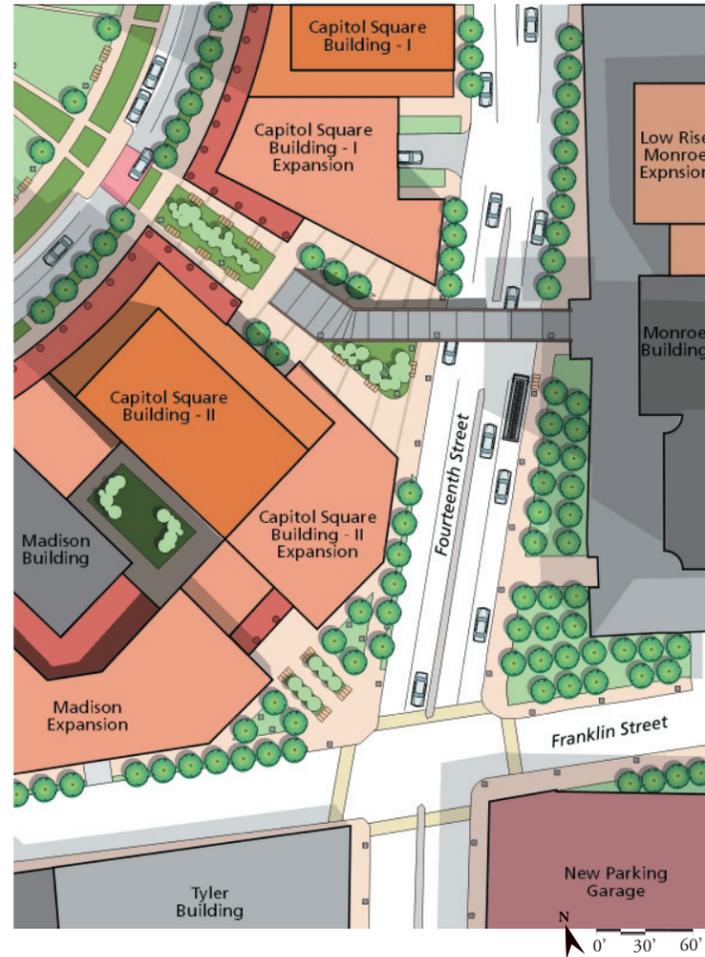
Site plan showing Monroe Building entrance to Capitol Square Plaza
